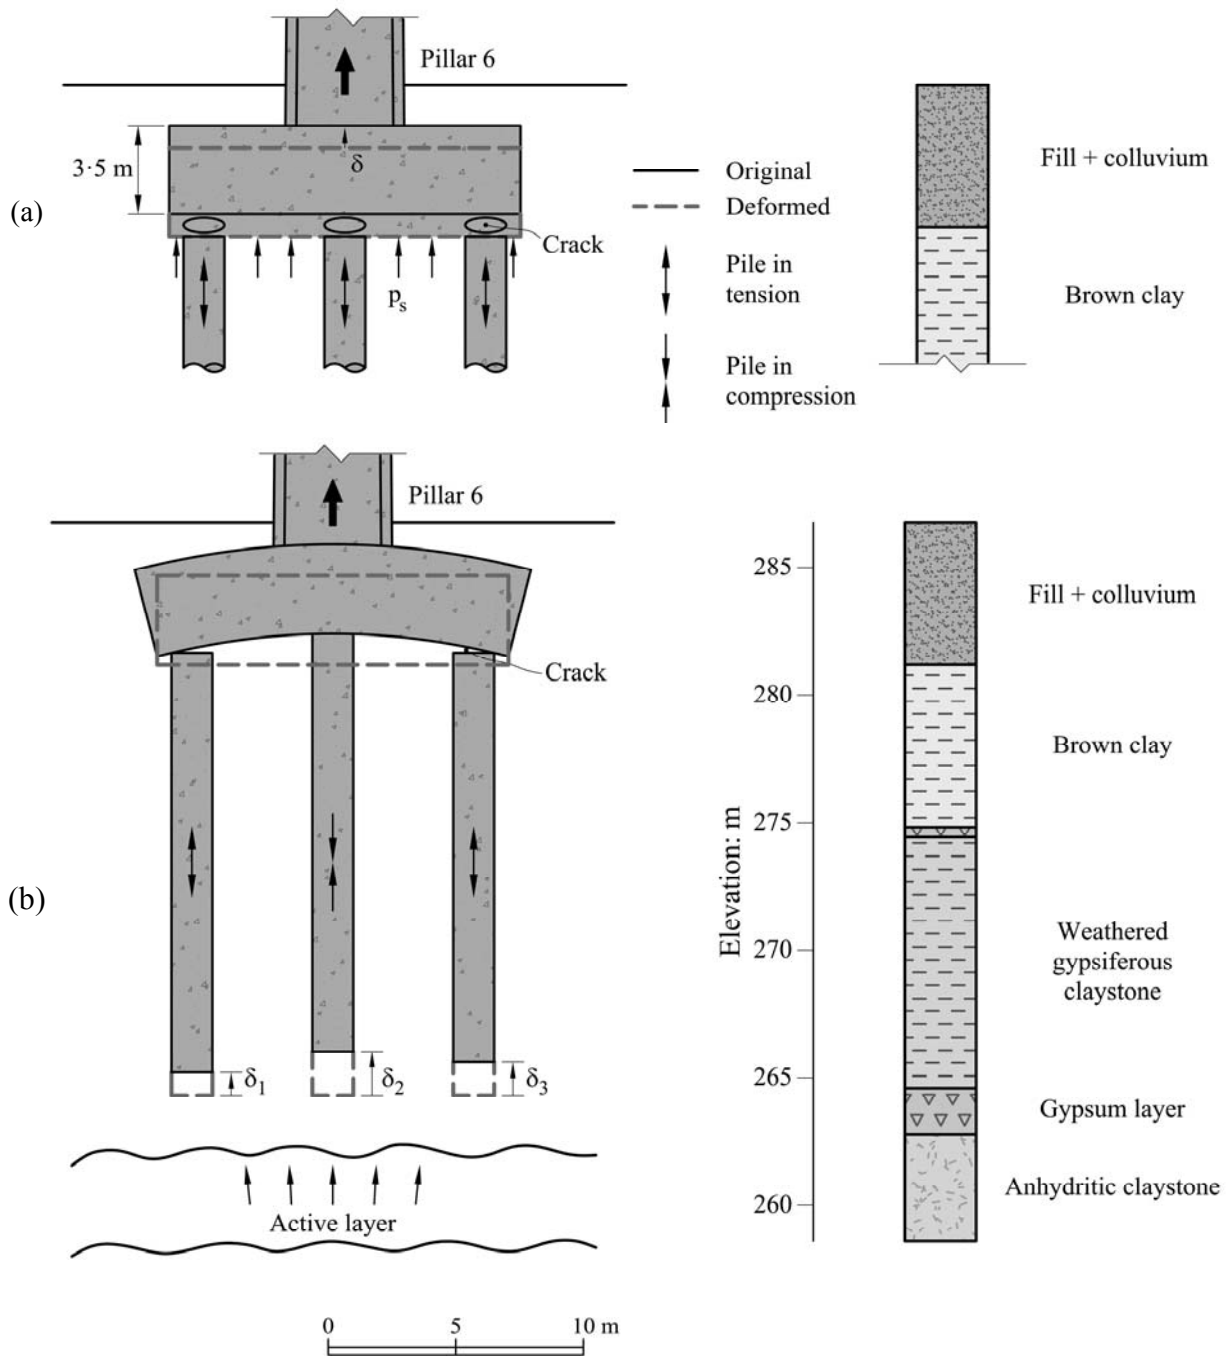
Sketches showing two alternative interpretations of foundation-heave interaction. Also shown is the geological profile in the vicinity of pillar P6. (a) Swelling pressure against the pile cap induces tensile strains in piles and lifts the pillar. A crack develops at the pile-cap contact. (b) Piles are pushed upwards because of heave at the deep active zone. Non-uniform heave creates a tensile gap between the cap and piles in most cases
